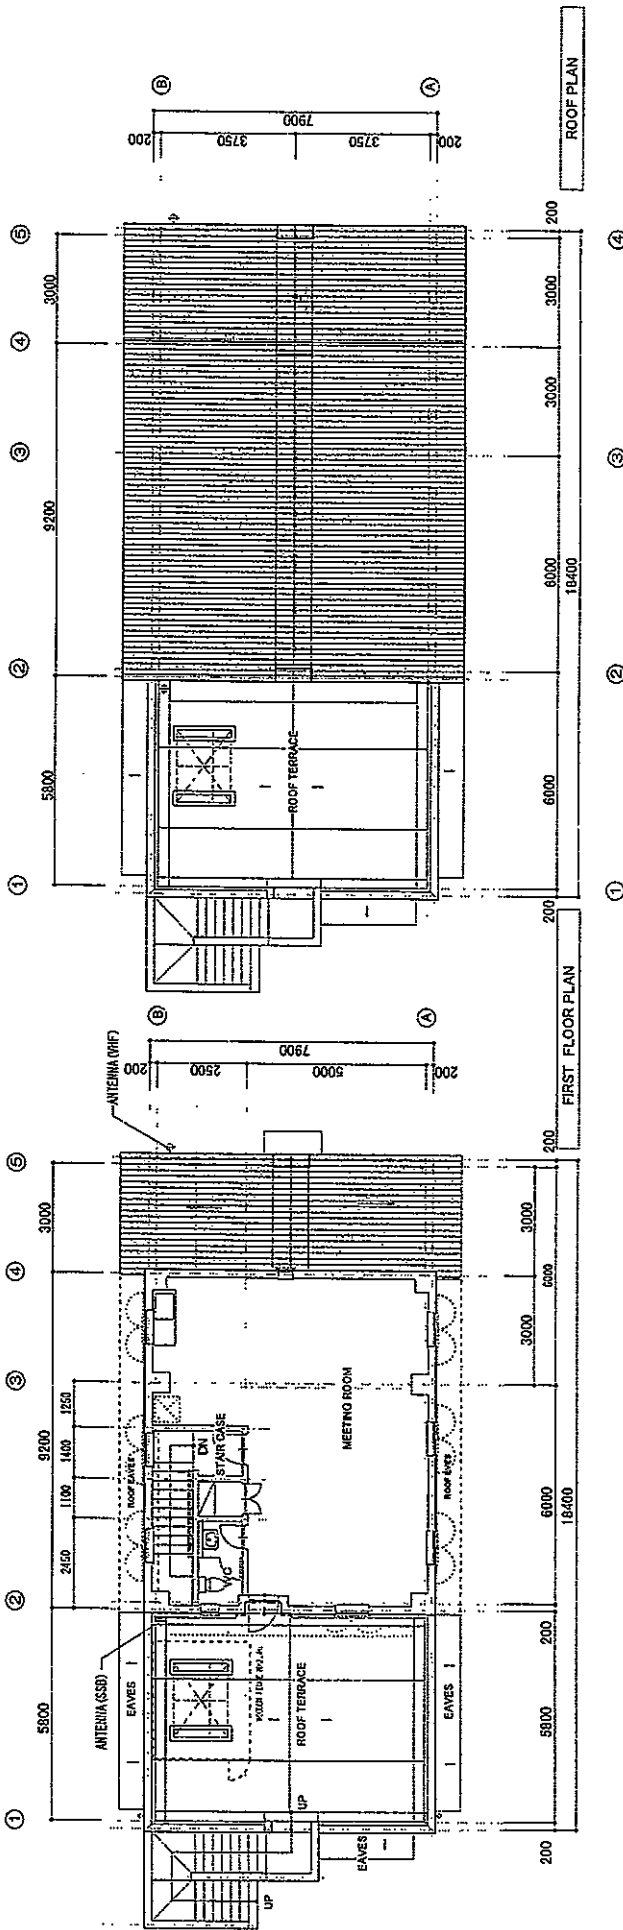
Plan of Old Road Community Fishery Centre Building
